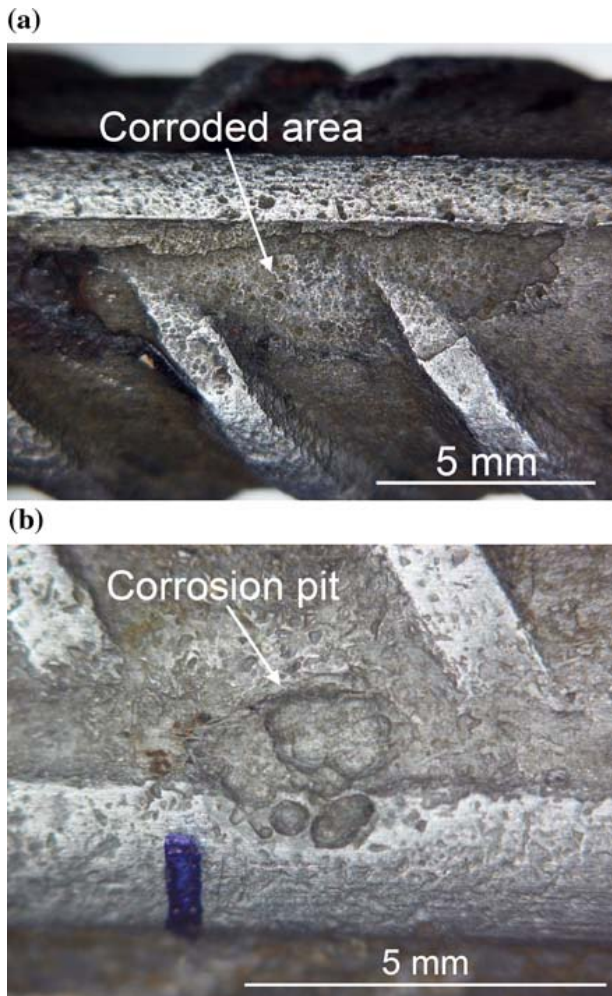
Images of corroding areas in the standard rebar from a Beam 2 (0.3 mm crack width) and b Beam 6 (1.2 mm crack width)
